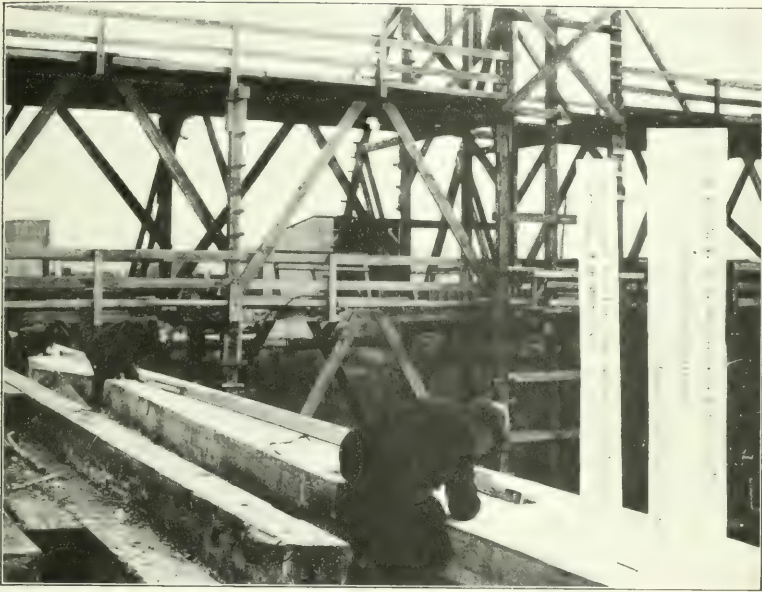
BEAM COMPASS, 37 FEET LONG, SET ON BASE, NORTH WALL, WEEHAWKEN SHAFT. PENNSYLVANIA RAILROAD TUNNELS.
